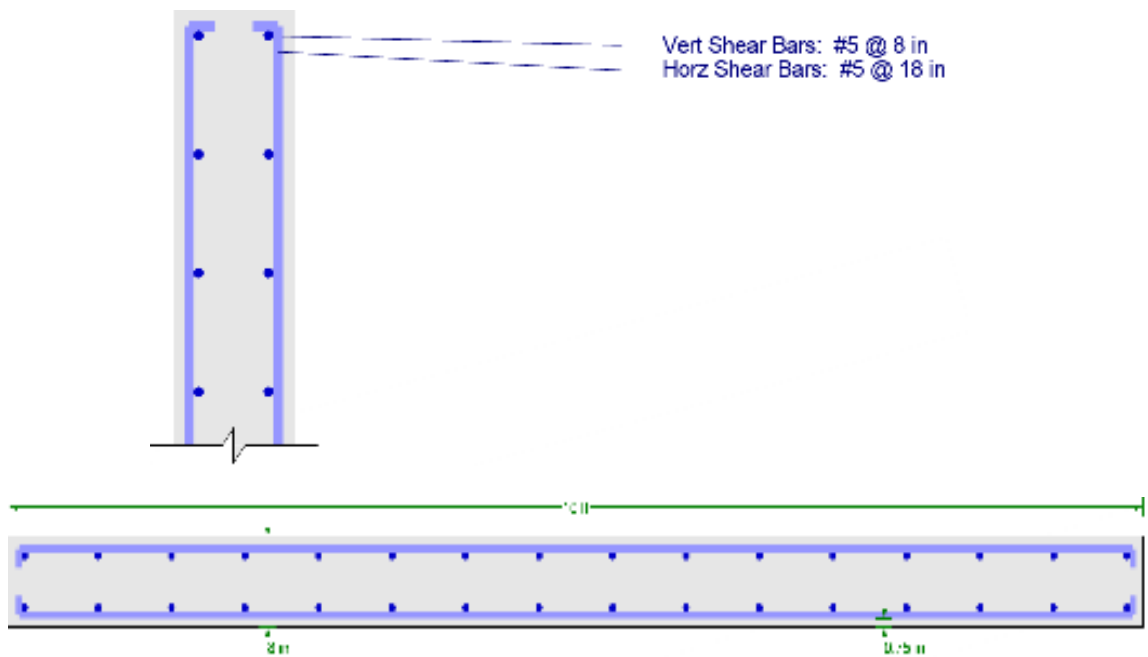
Sample Special RC Shear wall Reinforcement Details for 6-Story Buildings (B2-6S-M-S); Wall Section for Floors 4-6
